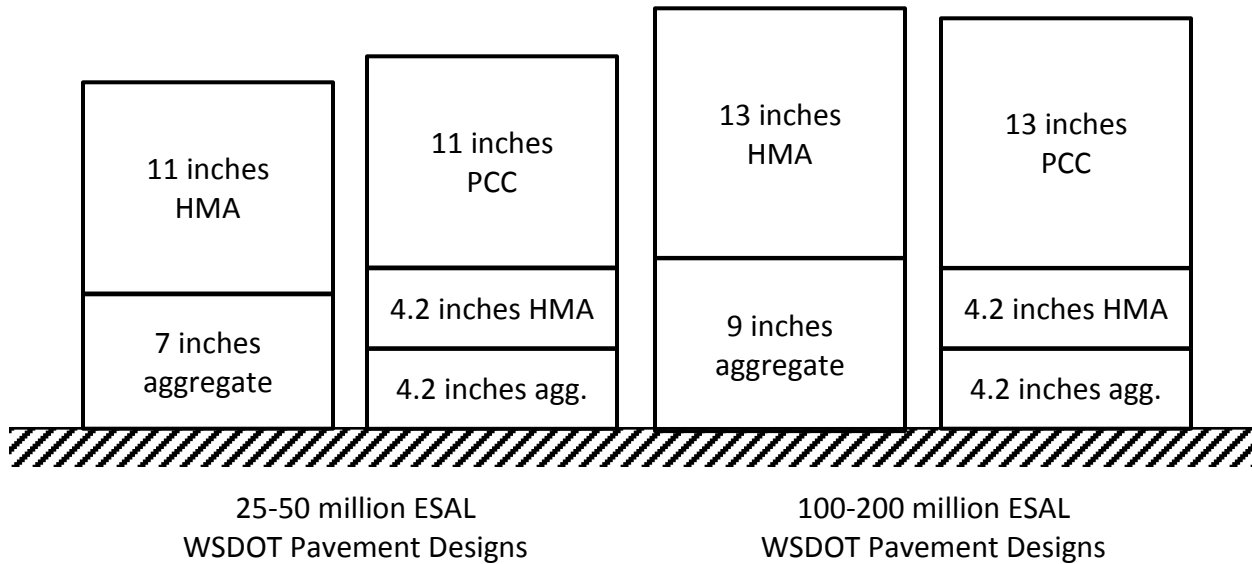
Pavement dimensions used for the pavement structure results (note: ESAL = equivalent single axle load).
